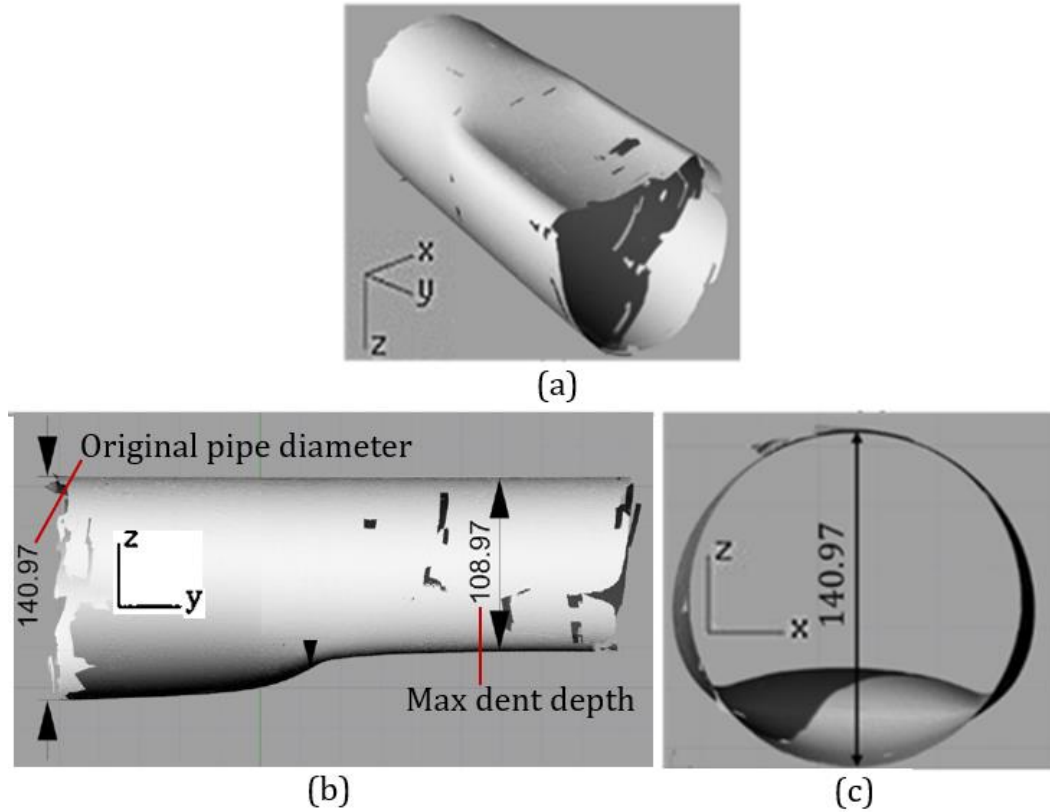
Scanned View of the Deformed Cylindrical Specimen a) Isotropic View, b) Z-Y View, c) Z-X View
